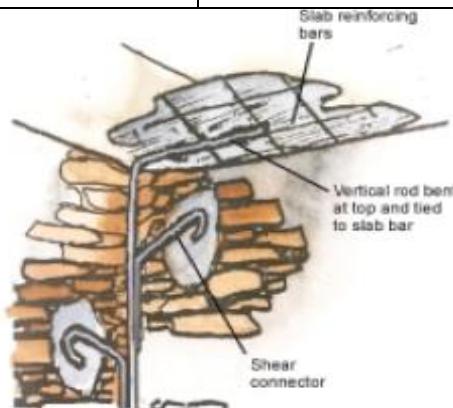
Connecting top bent end of vertical rod to slab (source: UNDP, UNECO & GOI, 2007)
